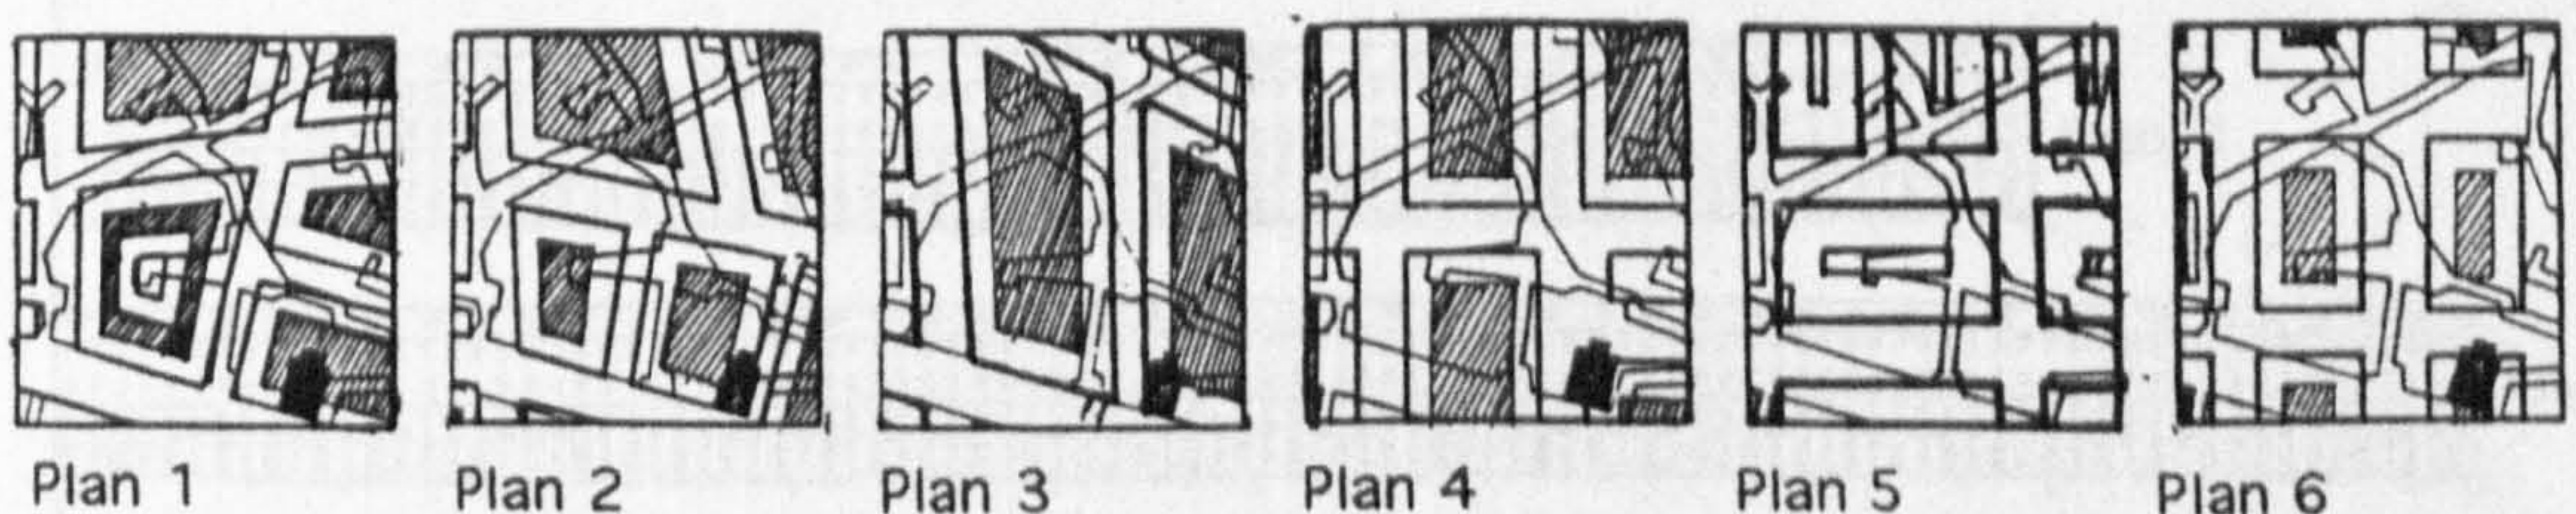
Showing hatched are the unventilated and internal rooms of the proposed plans.
